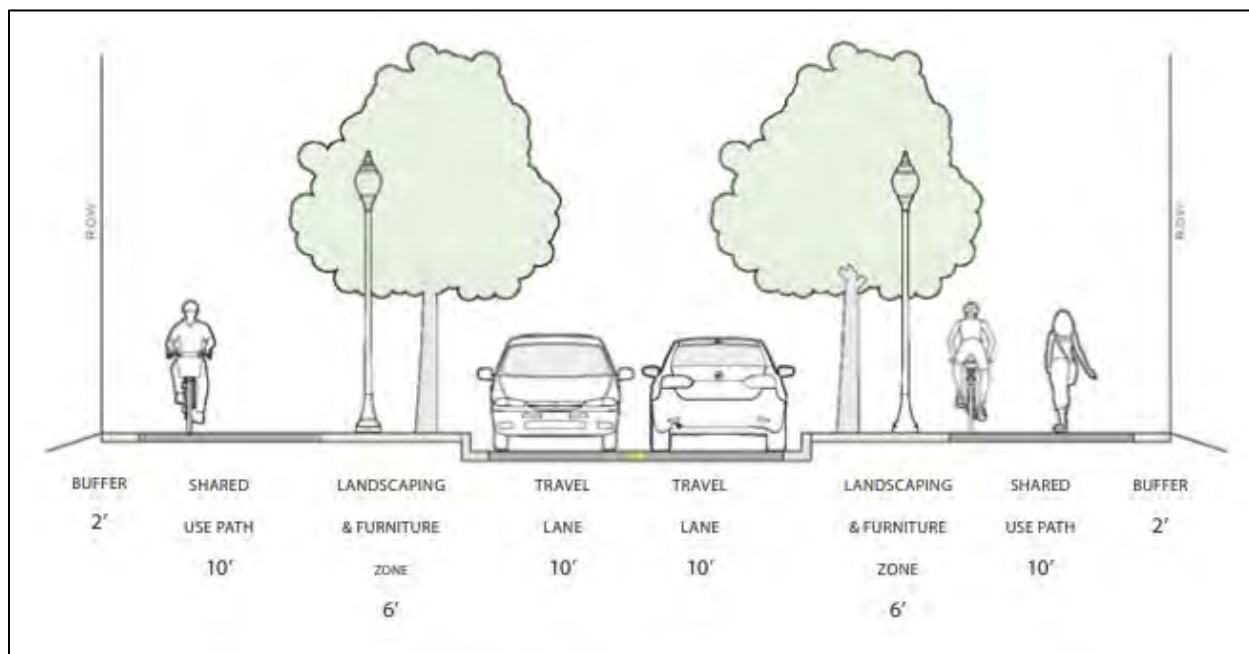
Example 56' park boulevard cross section (source: City of Gaithersburg, MD)
